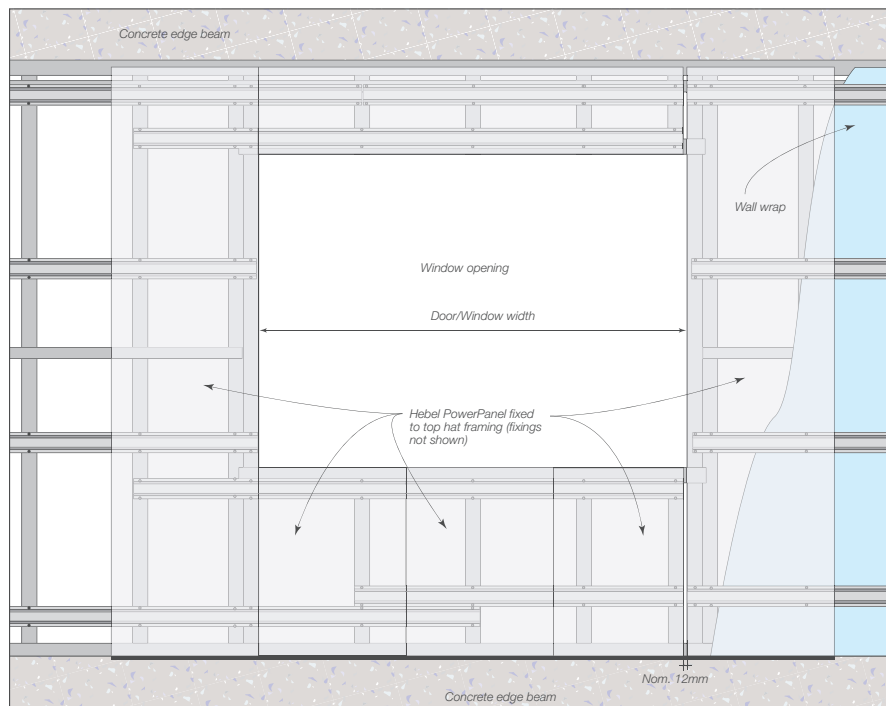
Window Opening Detail (Visible Edge Beam shown)
